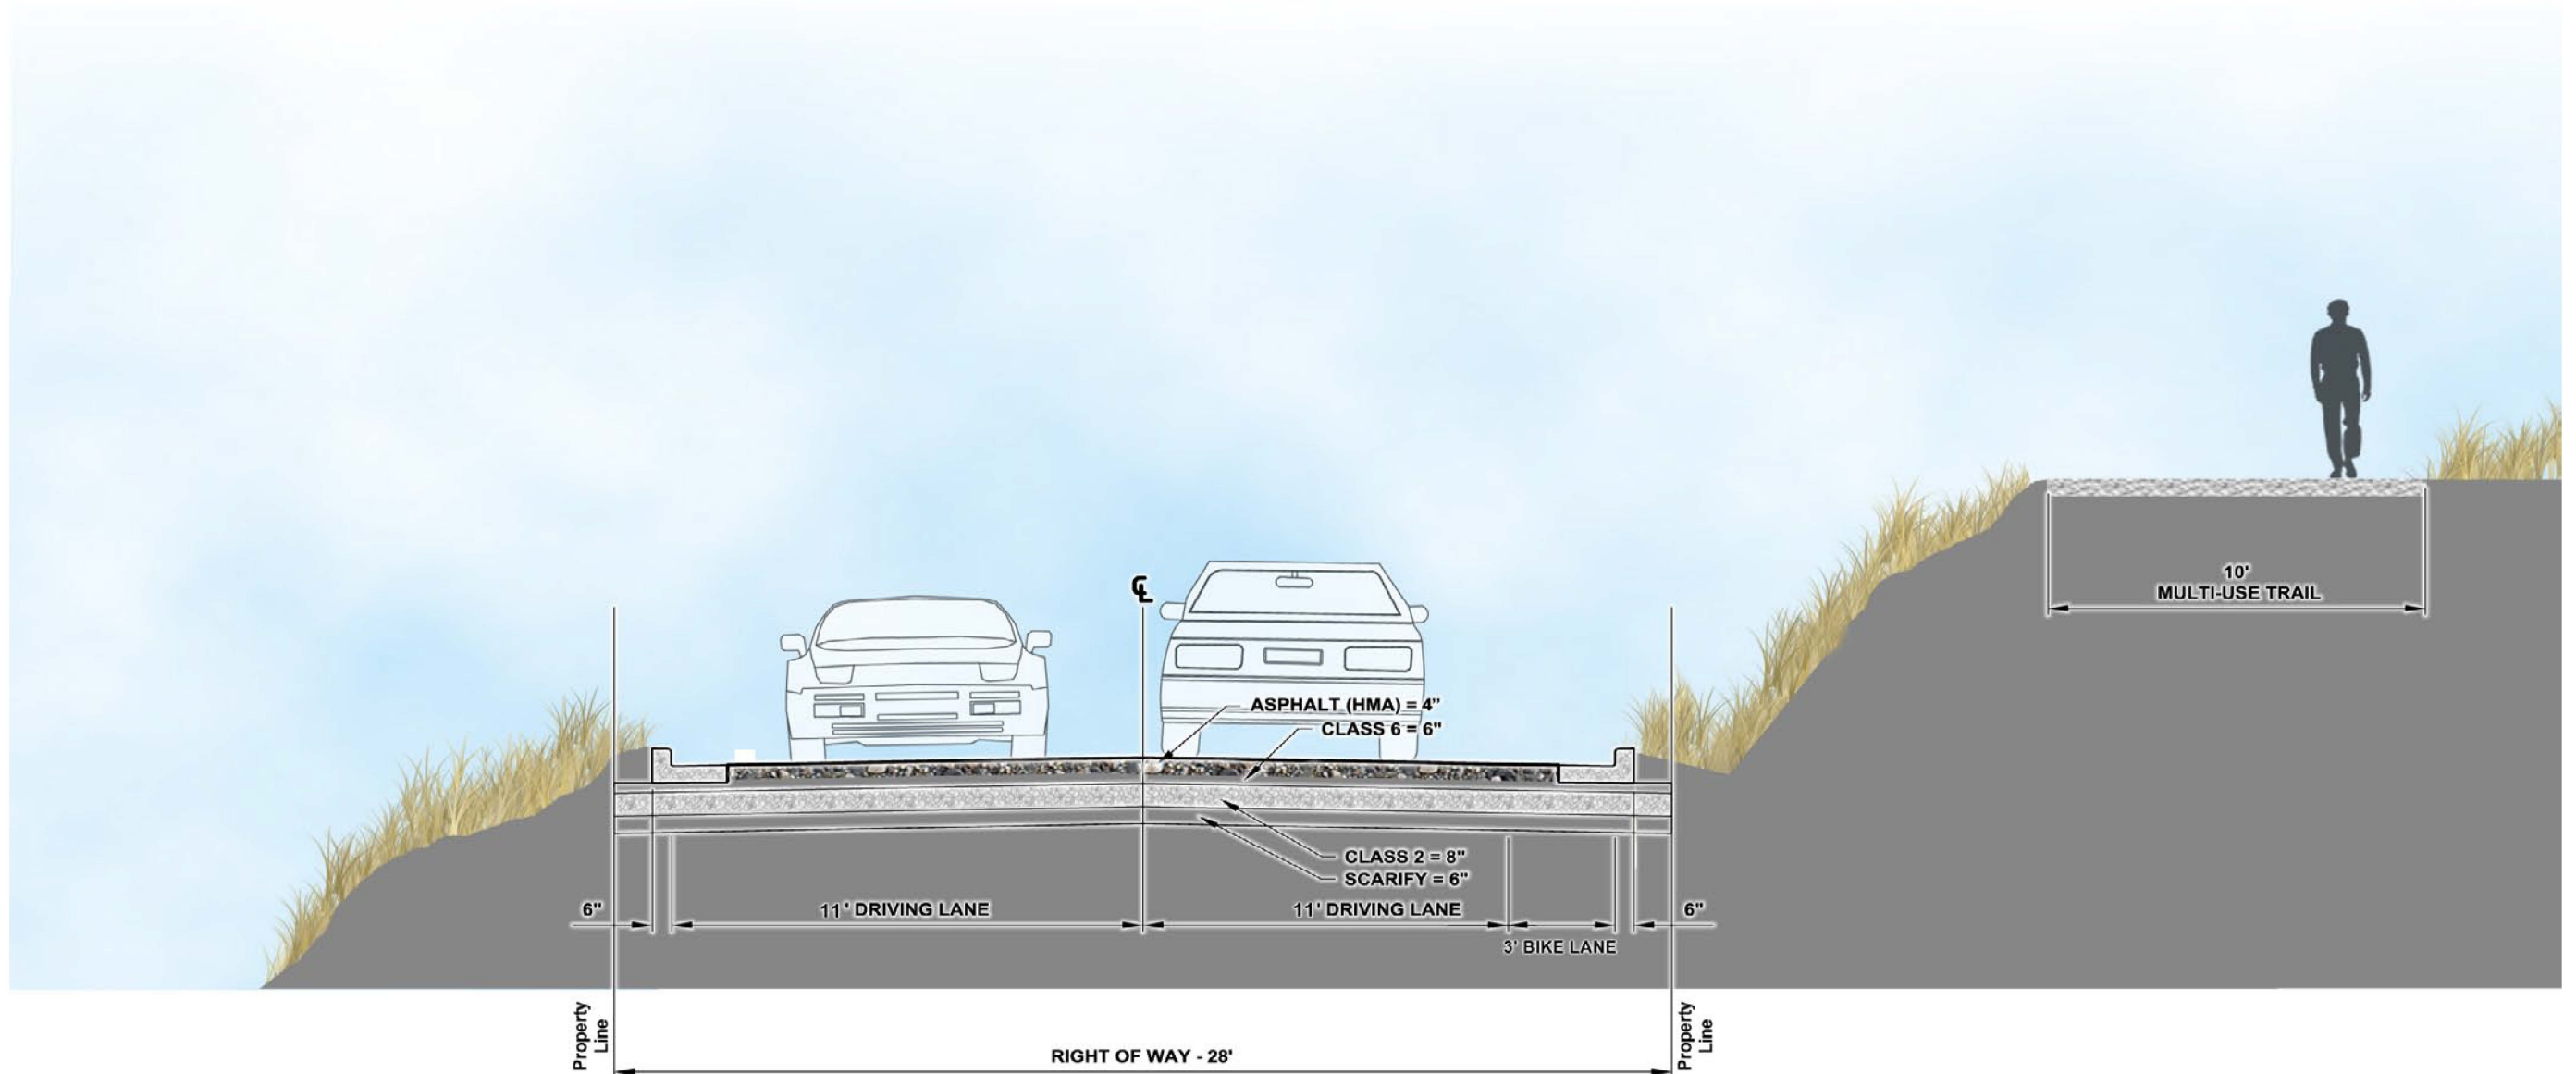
EXHIBIT J : ROADWAY SECTION - LA POSTA ROAD (PHASE 1)
